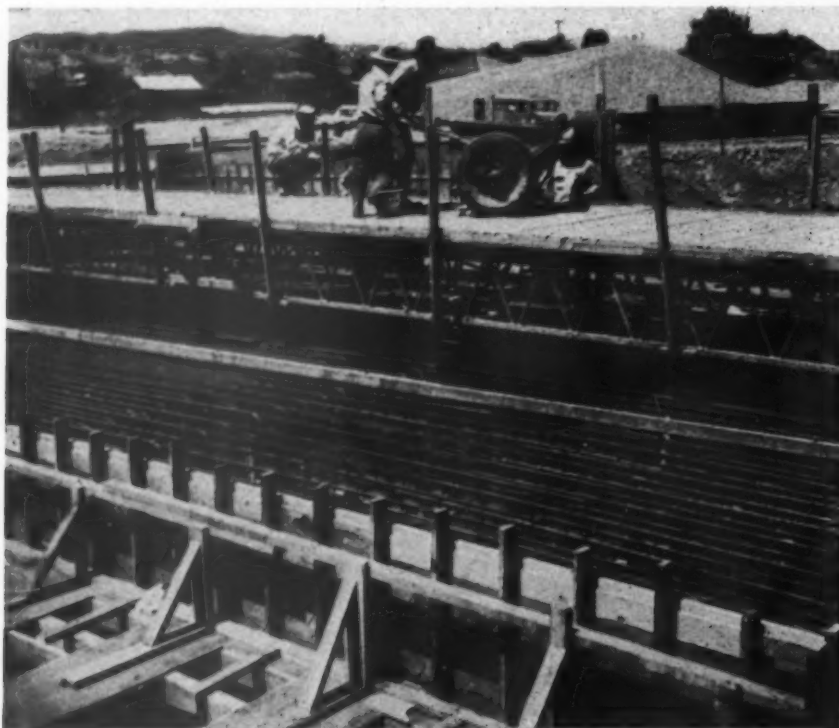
Typical concrete pouring operation showing buggy on moveable bridge. Steel arrangement is typical of decks. Again note neat form design and framing
